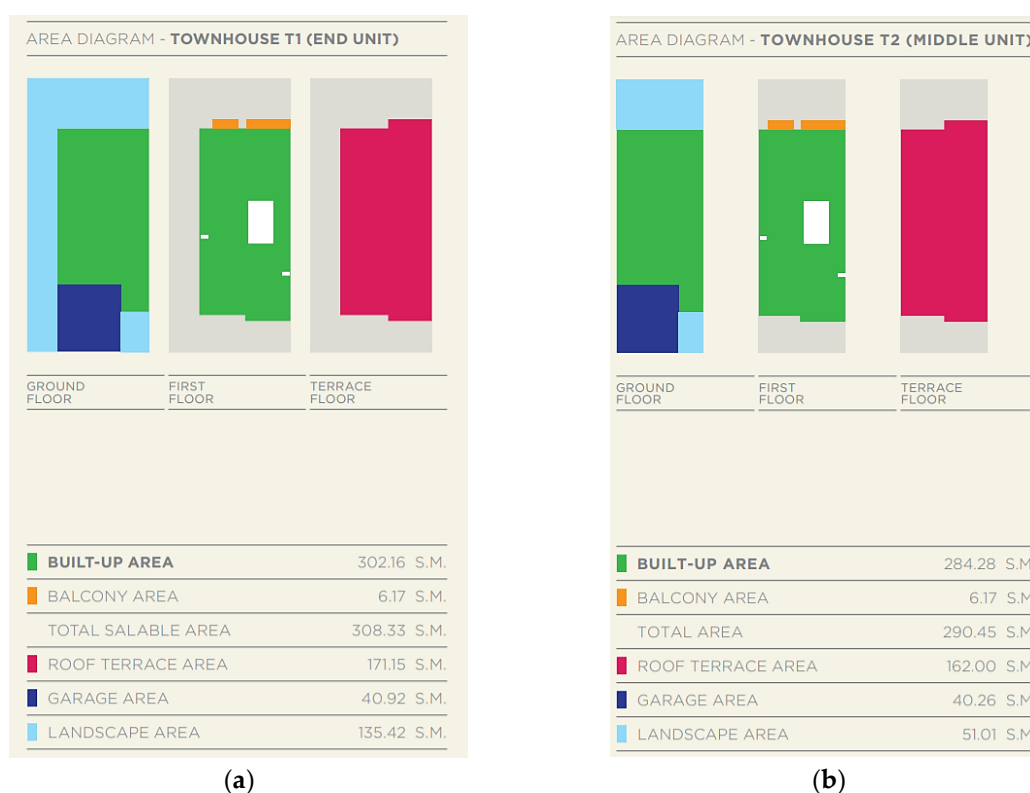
Townhouse Building Area Diagram (a) End Unit; (b) Middle Unit [11]
